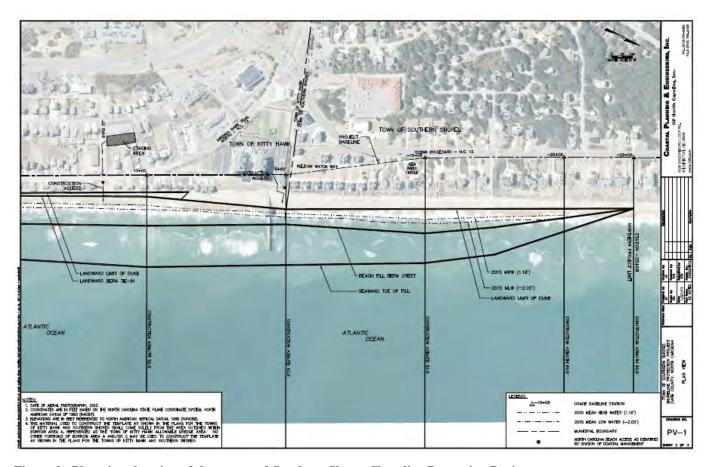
Plan view drawing of the proposed Southern Shores Shoreline Protection Project.
